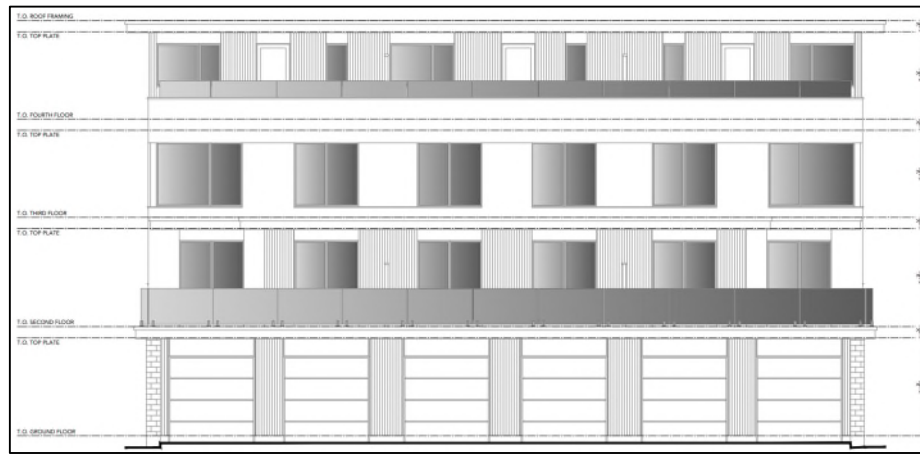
Conceptual Elevation – Back-to-Back Towns
